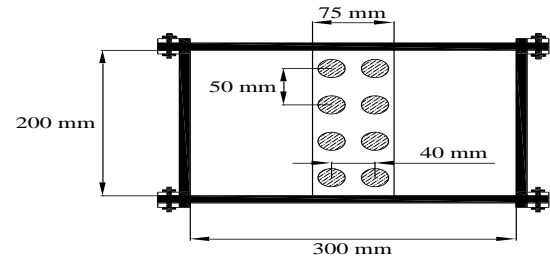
Dimension of the used box and CDM column arrangement (TS-4)
